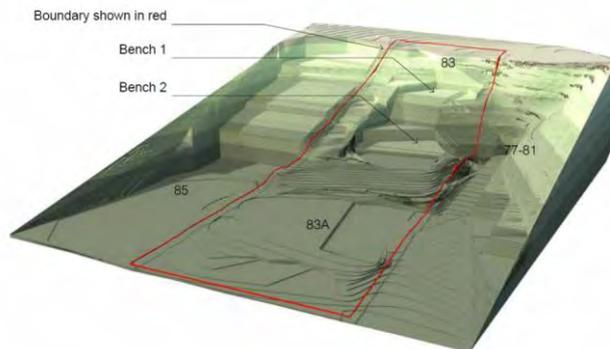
Topographical Map of the subject site demonstrating the existing ground level as a result of the excavation and modification to accommodate the existing dwellings (site boundary identified in red as viewed from the Harbour looking south) (Source: Urban Design Statement)
